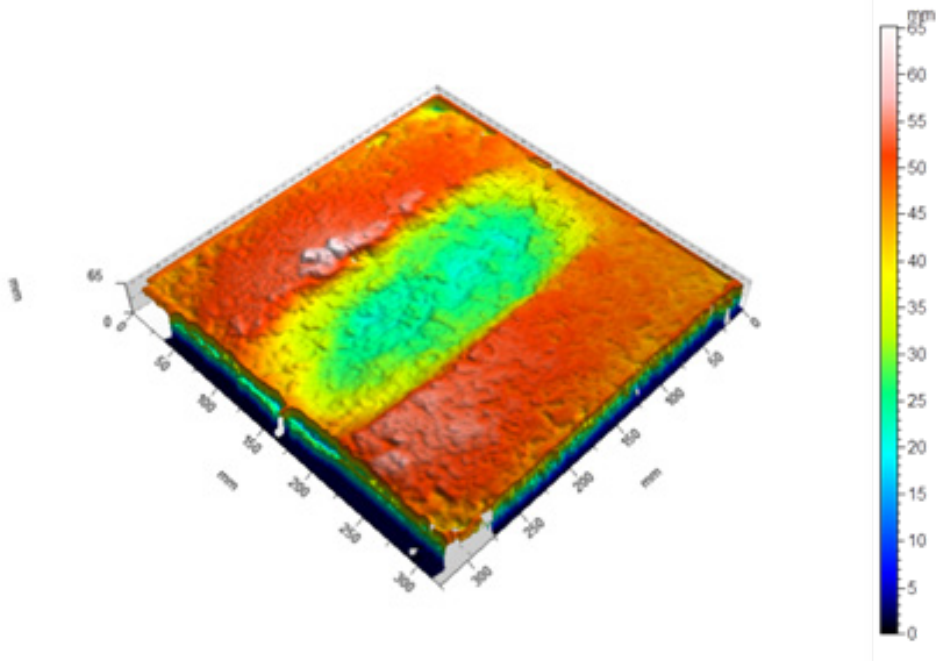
Example of poorly compacted test specimen 3D model after testing showing reference mould.
